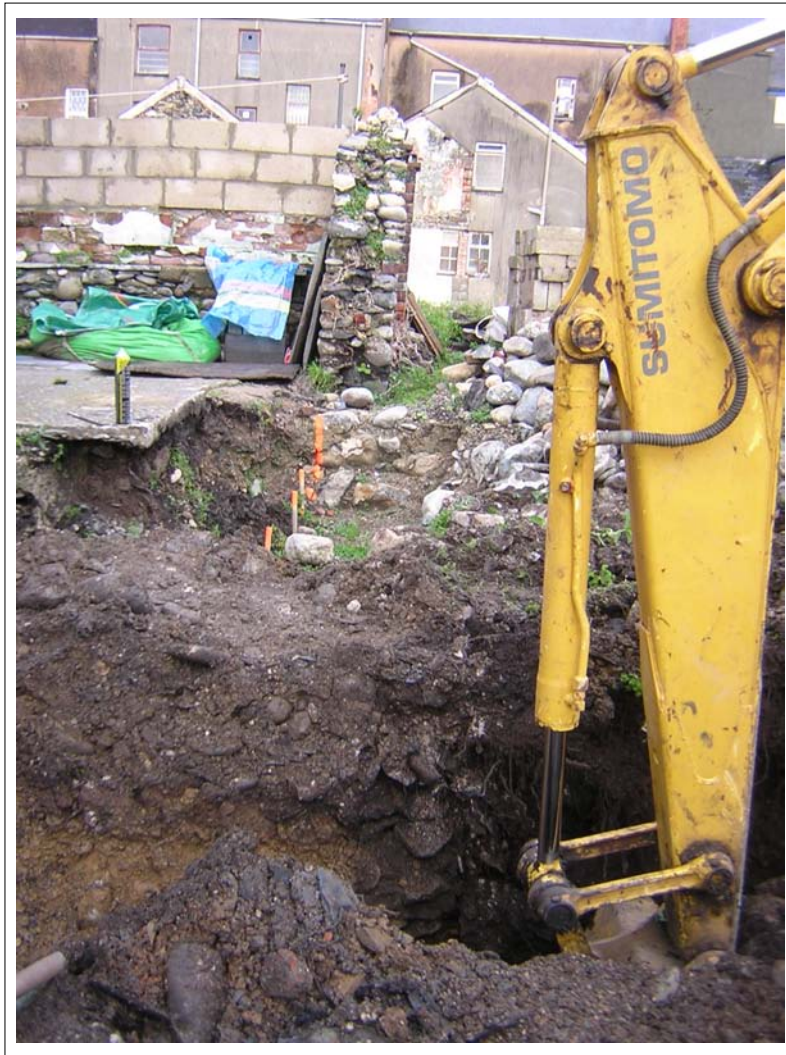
View of foundation cut for modern building demolished prior to excavation, Looking north
